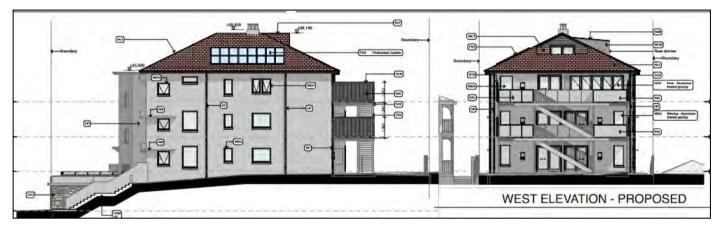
Northern (Side) Elevation (left) and Western (Rear) Elevation (right).
